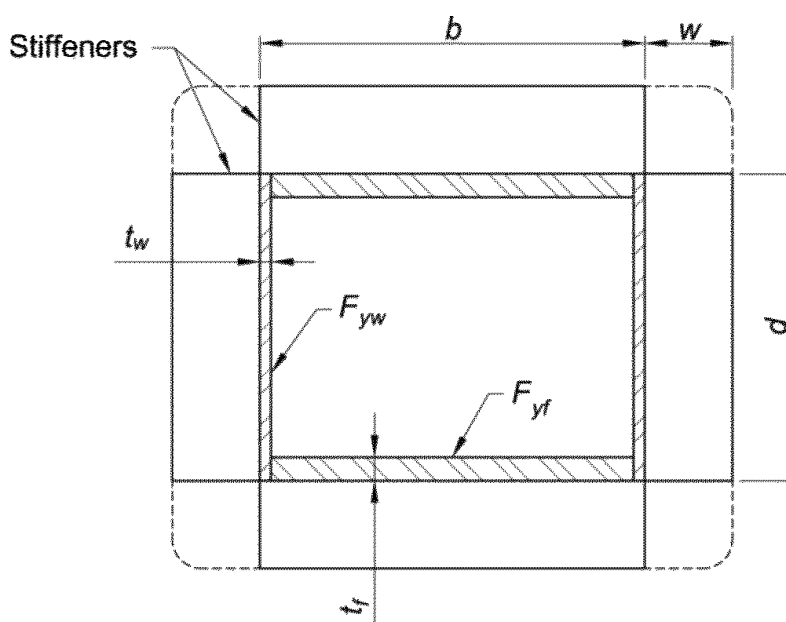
Built-up box link cross section with intermediate stiffener.
